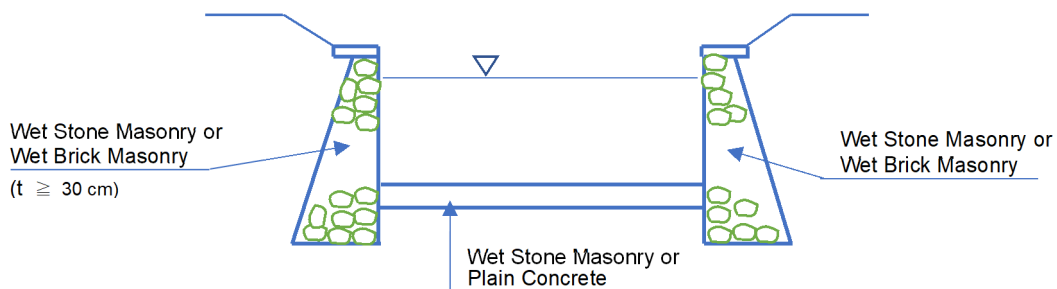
Typical Cross-Section of Wet Masonry Lining Canal Retaining Wall Type
